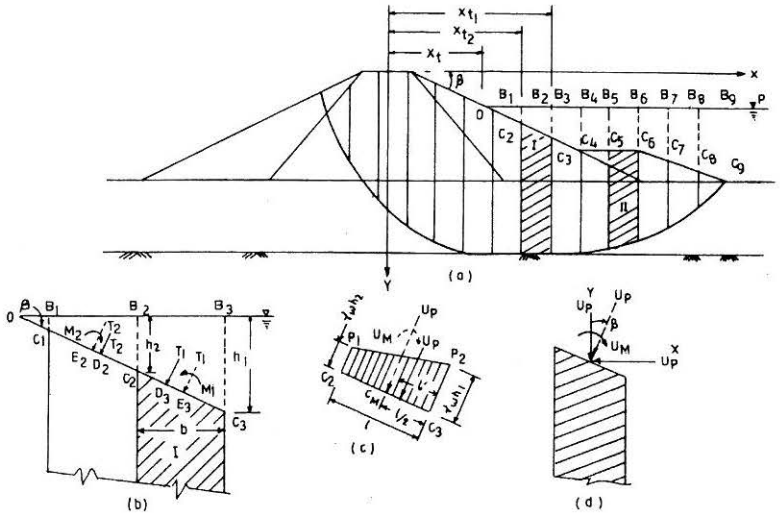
Forces due to Water Ponding on the Face of a Slope
